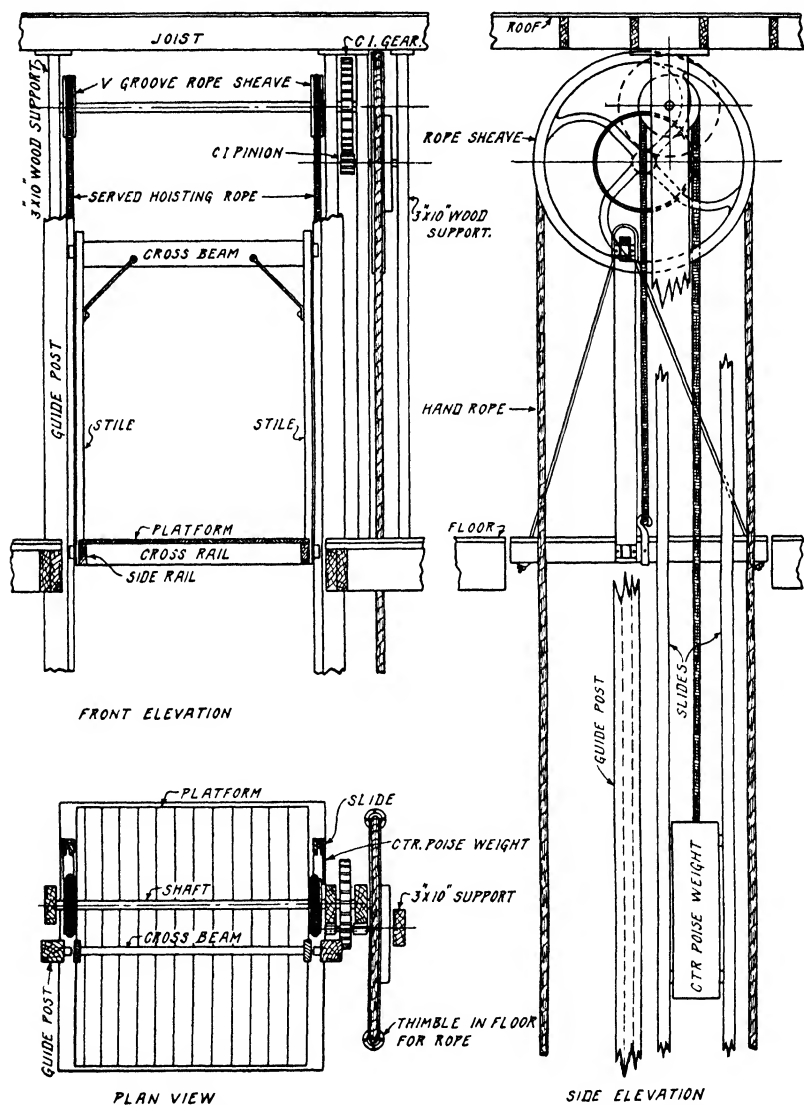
Details of Hand Elevator Showing Use of Served-Rope Hoist
